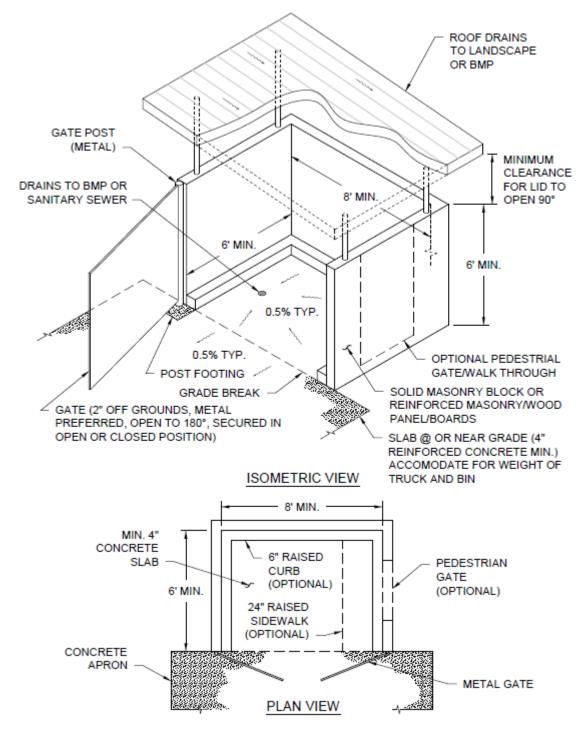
Typical Isometric and Plan View of a Trash Enclosure BMP
